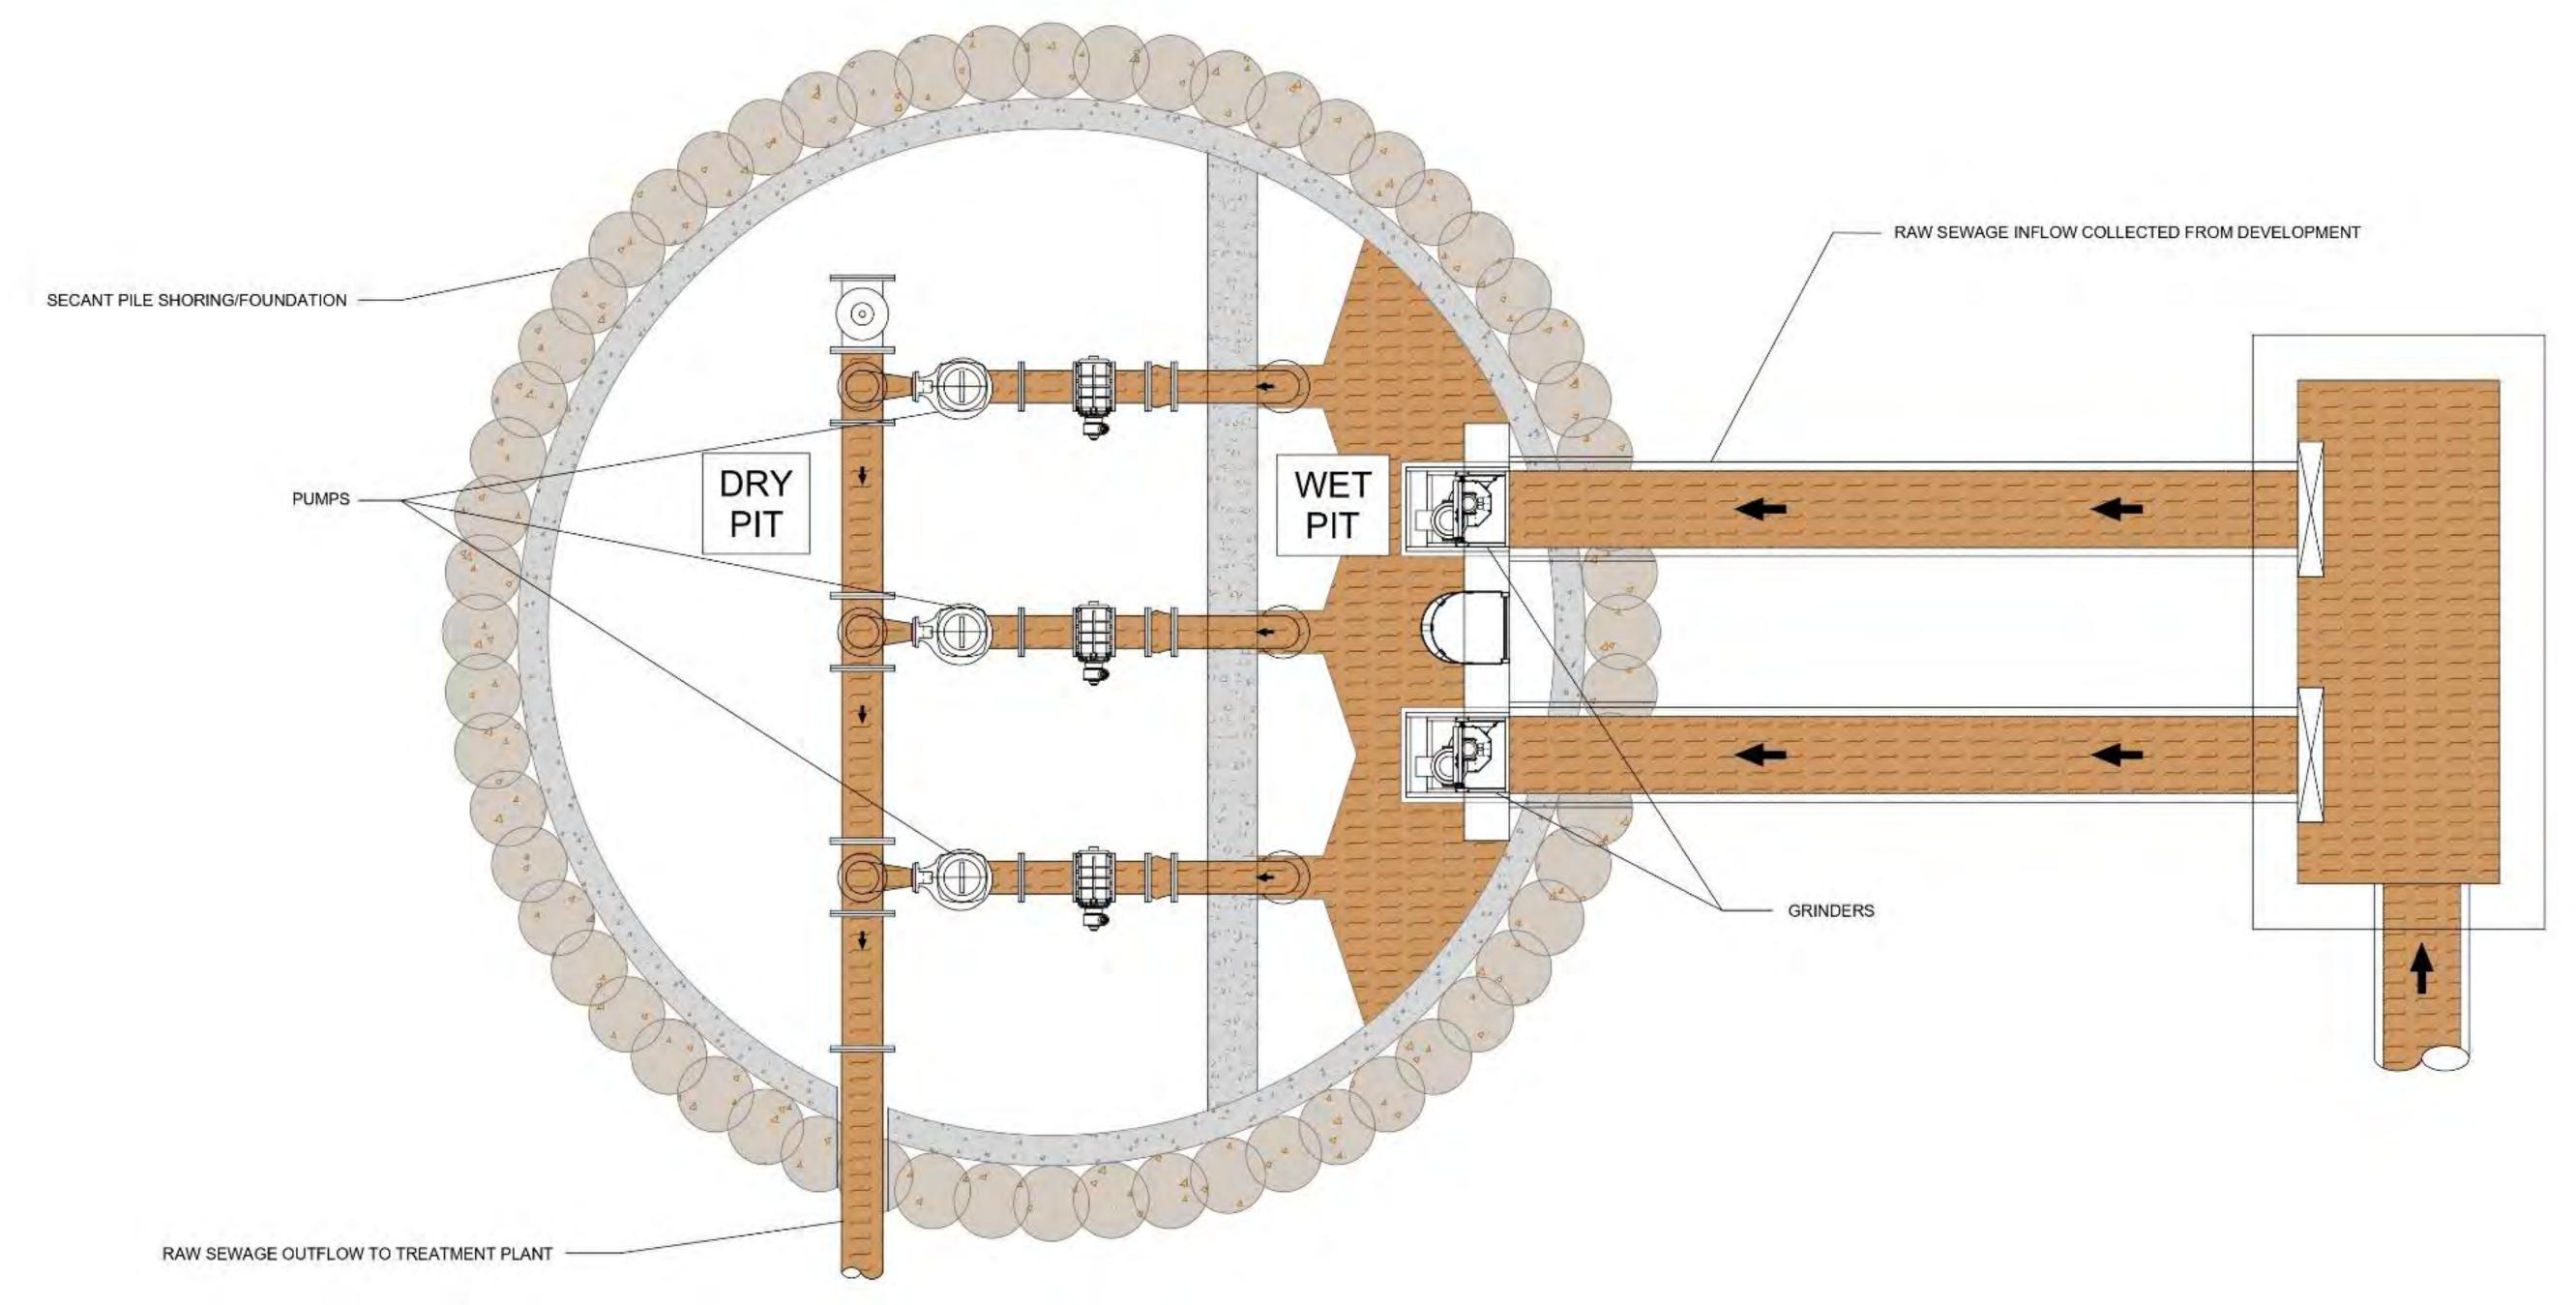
DETAIL A - LIFT STATION SECTION - LOOKING WEST
